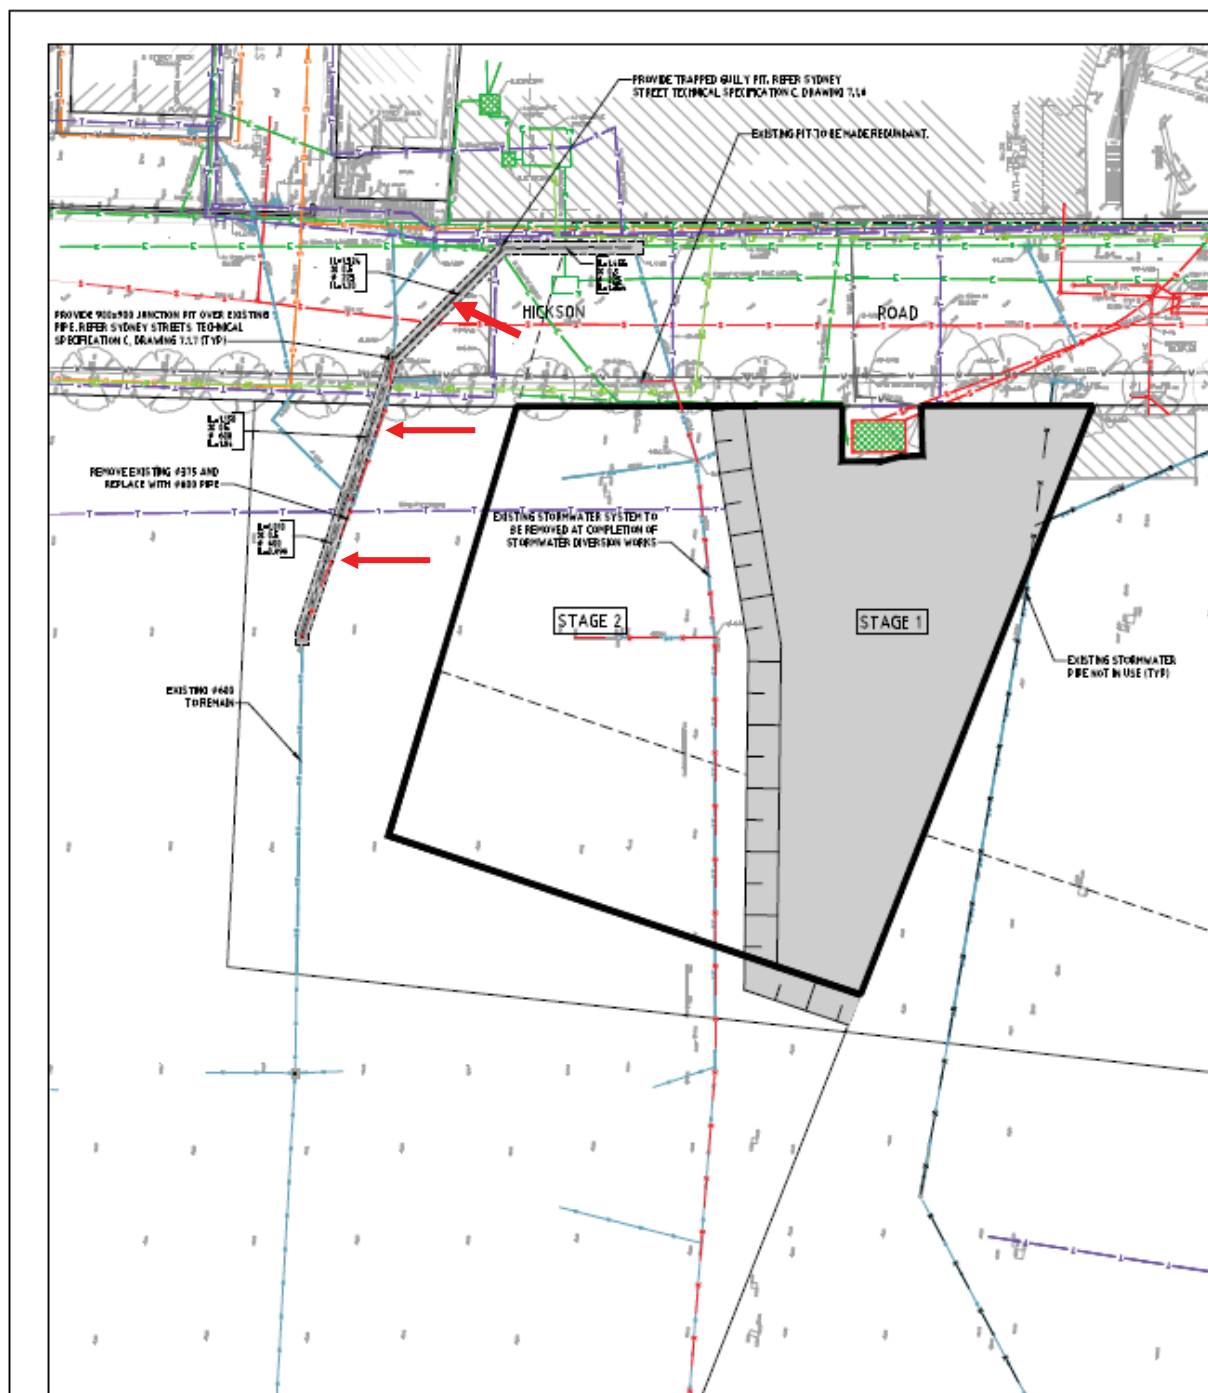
Plan of the Option 1 stormwater services diversion. Red arrow indicates excavation of a trench in Block 5 to the north of the remediation area. Cardno plan
